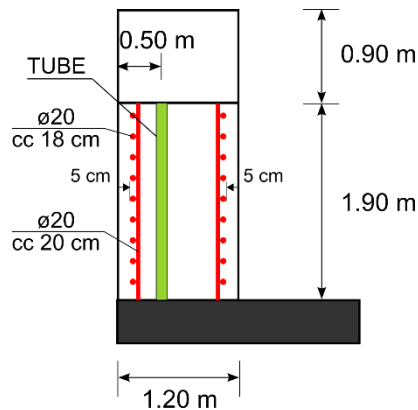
Details of reinforcement in the Civaux mock-up wall (lift 1 only).
